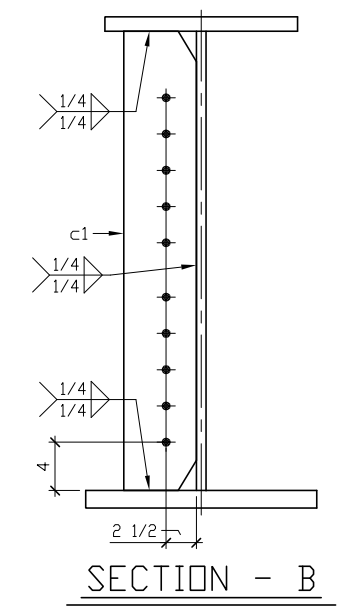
DETAILS OF STRUCTURAL STEEL (SHEET NO. 2 OF 3)
